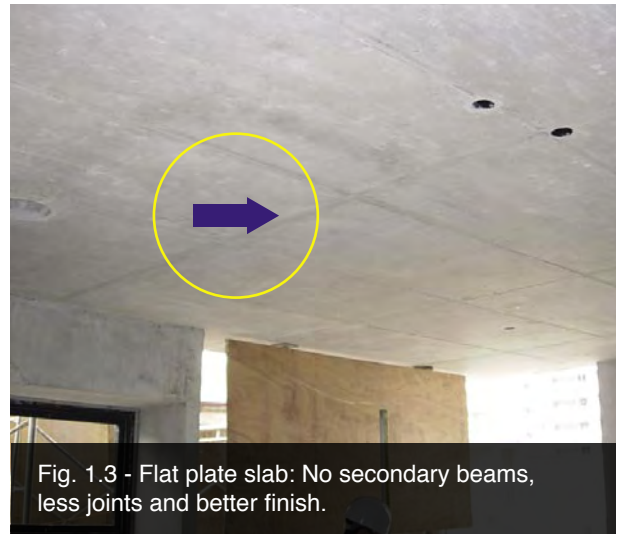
Flat plate slab: No secondary beams, less joints and better finish.
